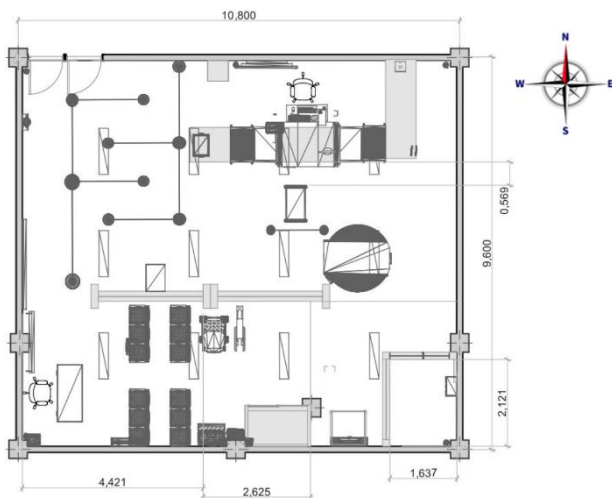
The 2D Layout of Developed Faskampen Laboratory
